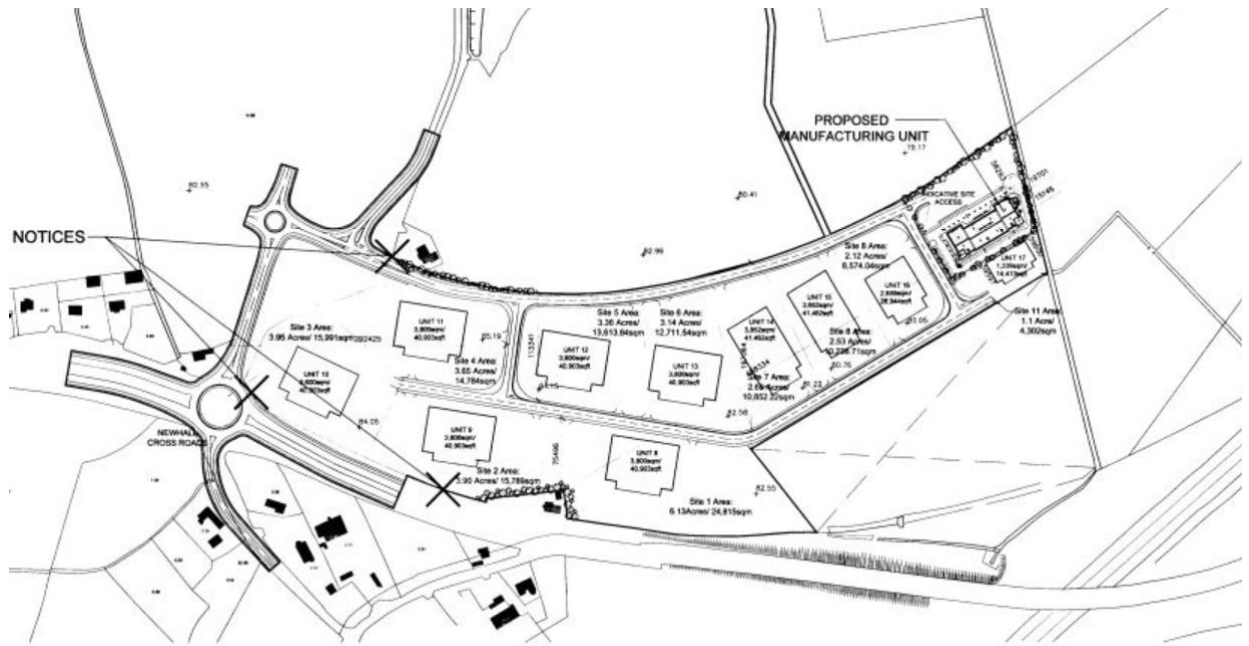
Extract of Site Layout Plan- Including Future Potential Development from Reg. Ref.: 06/707
